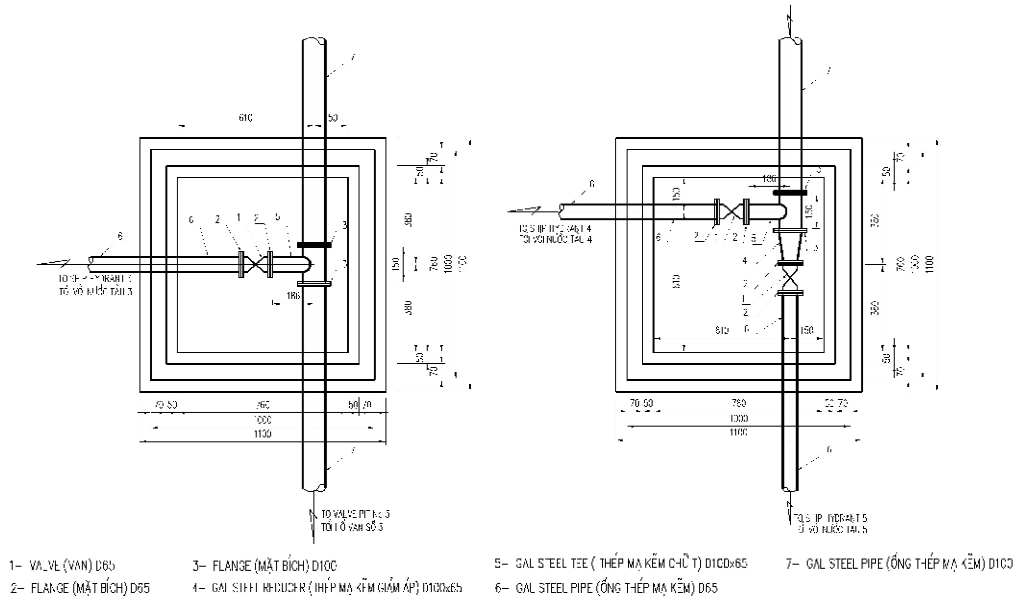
Connection Pits to Ship Hydrants (2 types)
